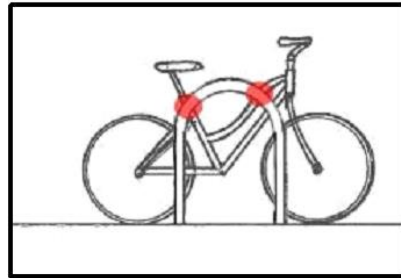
(a)(3): Example Bicycle Parking Layouts
